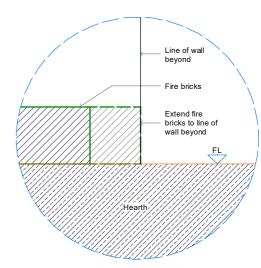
Plan View Fire Surround Opt. 1 Timber Cavity
